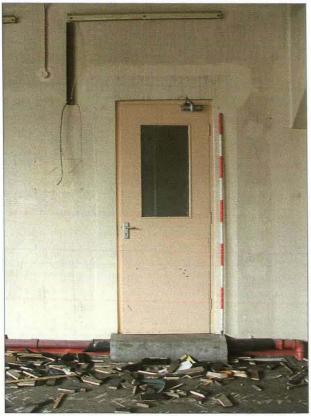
Door at north-east end of ground floor large hall (Scale = 2m)
